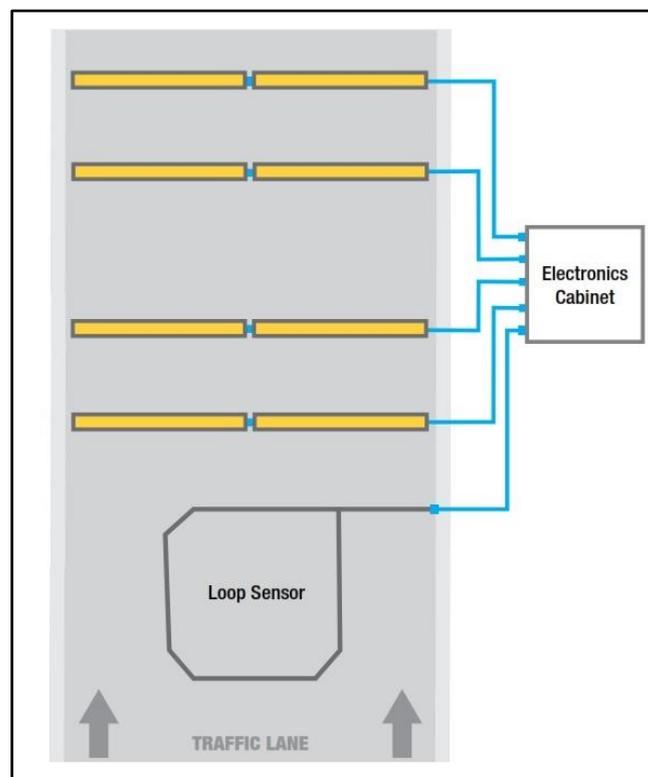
Typical Strip Sensor Configuration Using 8 Sensors
